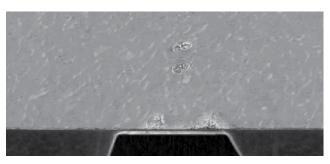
WELDED ATTACHMENT (Pictured from bottomside)
